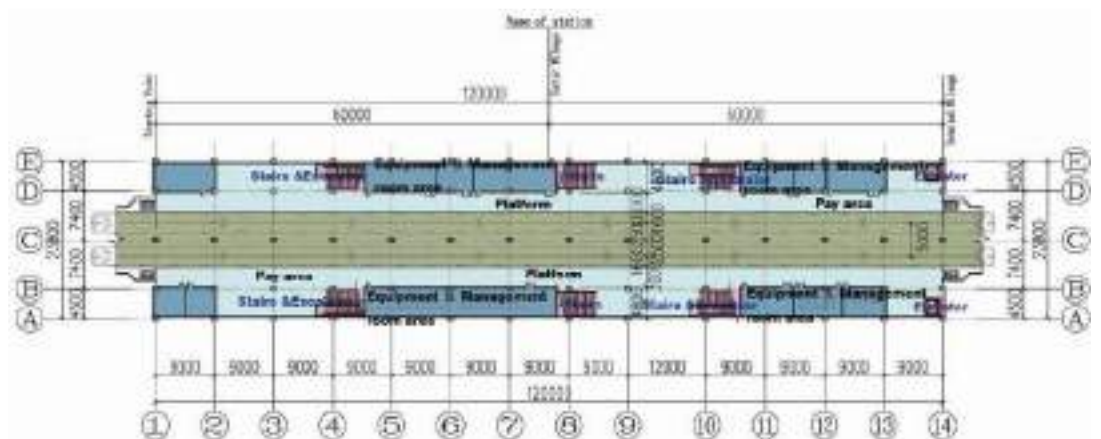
Plan of Typical Ground Floor (Platform Level)
